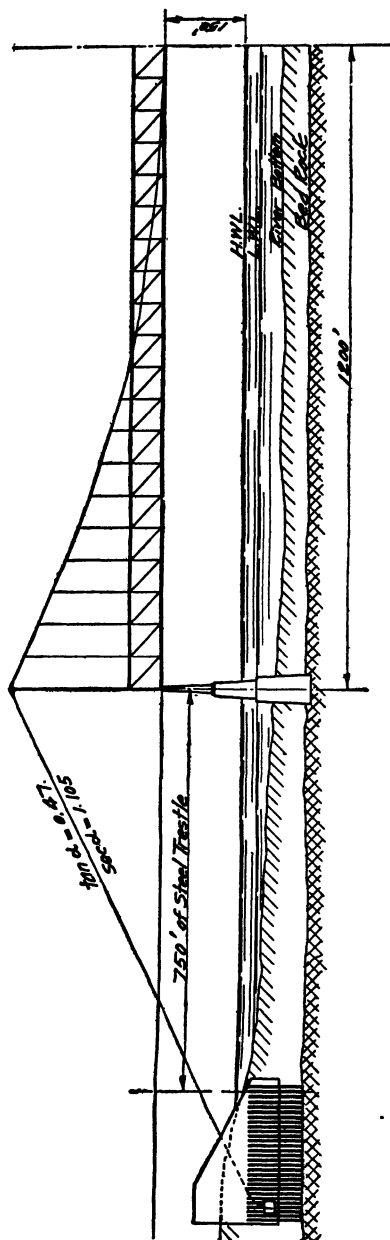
Layout for 2,400-foot Span Suspension Railway Bridge.
